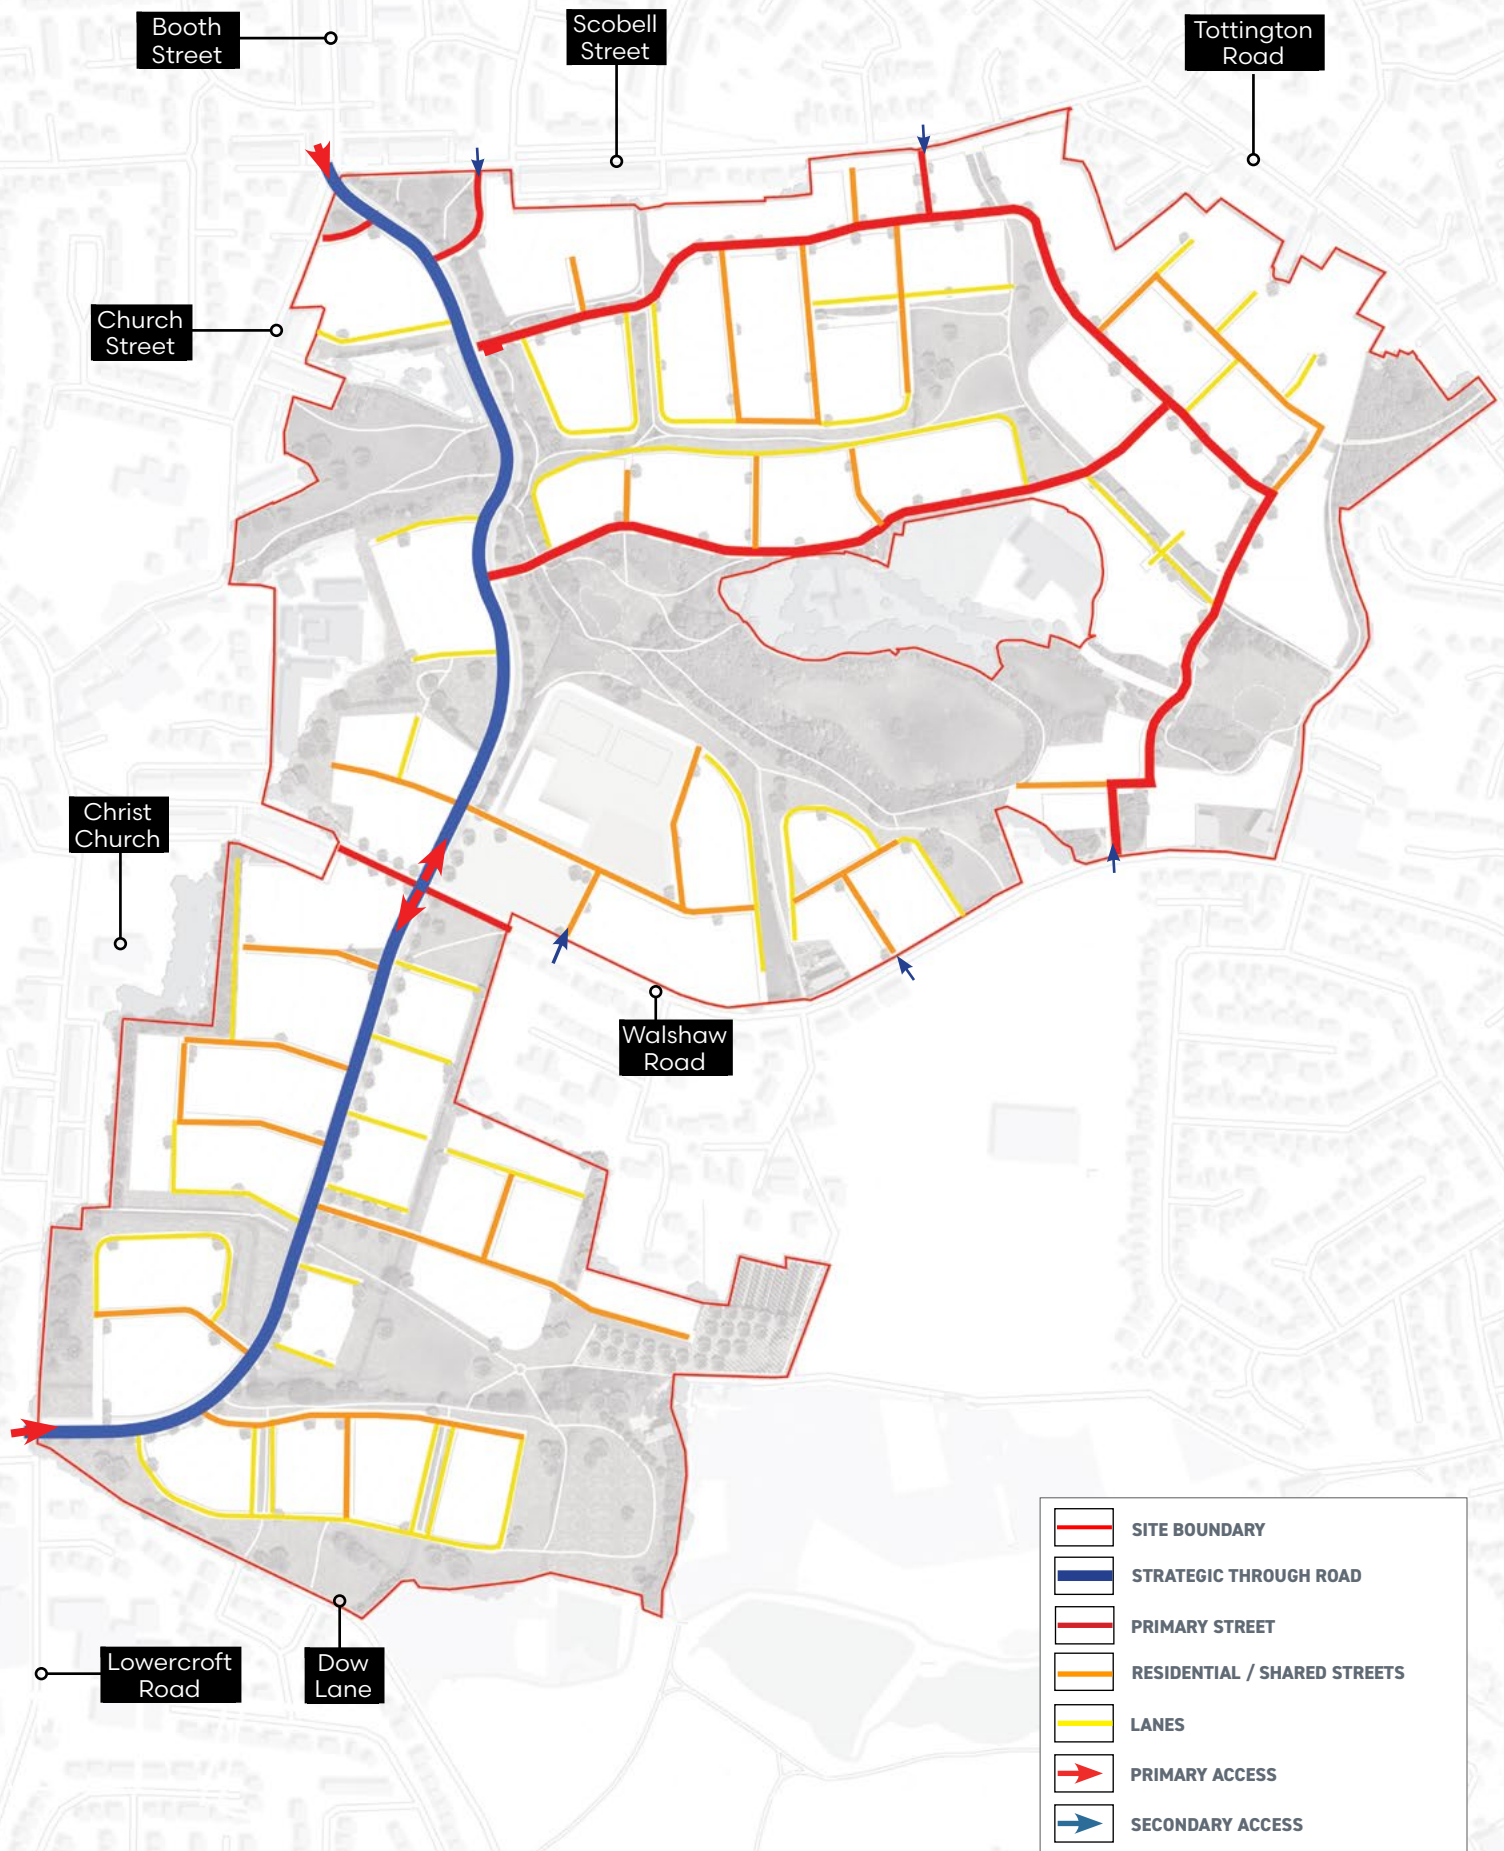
ACCESS AND MOVEMENT STRATEGY PLAN
